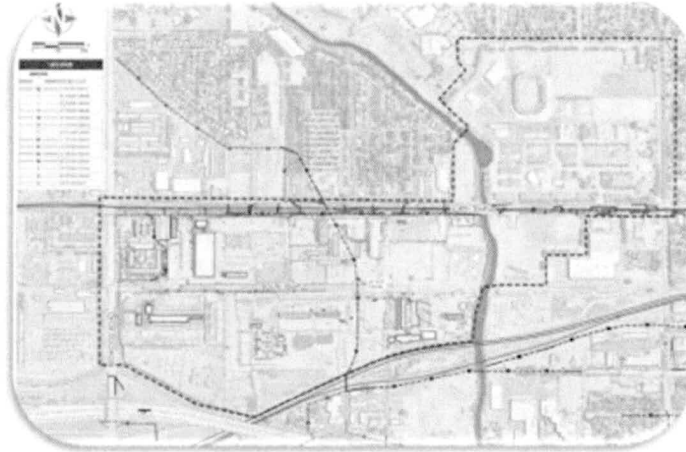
Project Boundary and Existing Site Storm Drain System
